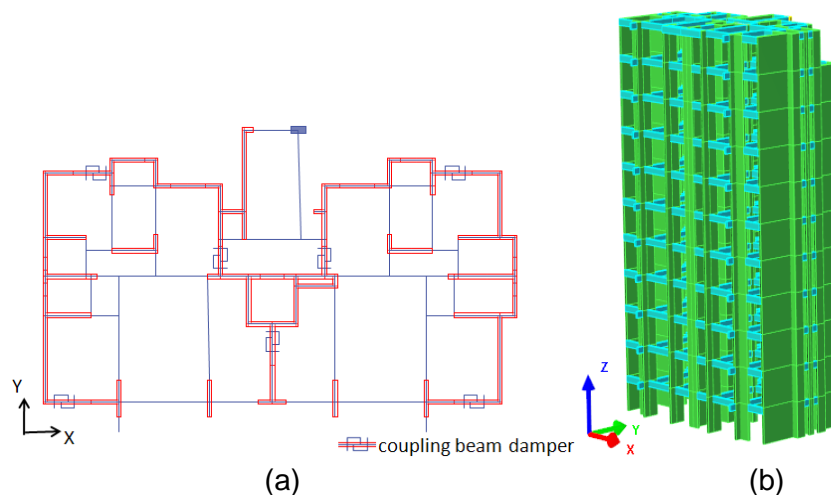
The layout of the shear wall and the coupling beam damper: (a) damper layout, (b) 3-D model
